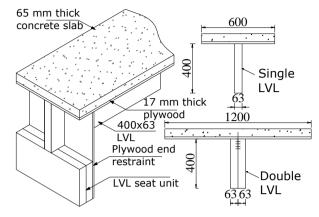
LVL seats to simply support the TCC floor beam specimens and, the width for single and double LVL TCC floor beams.
